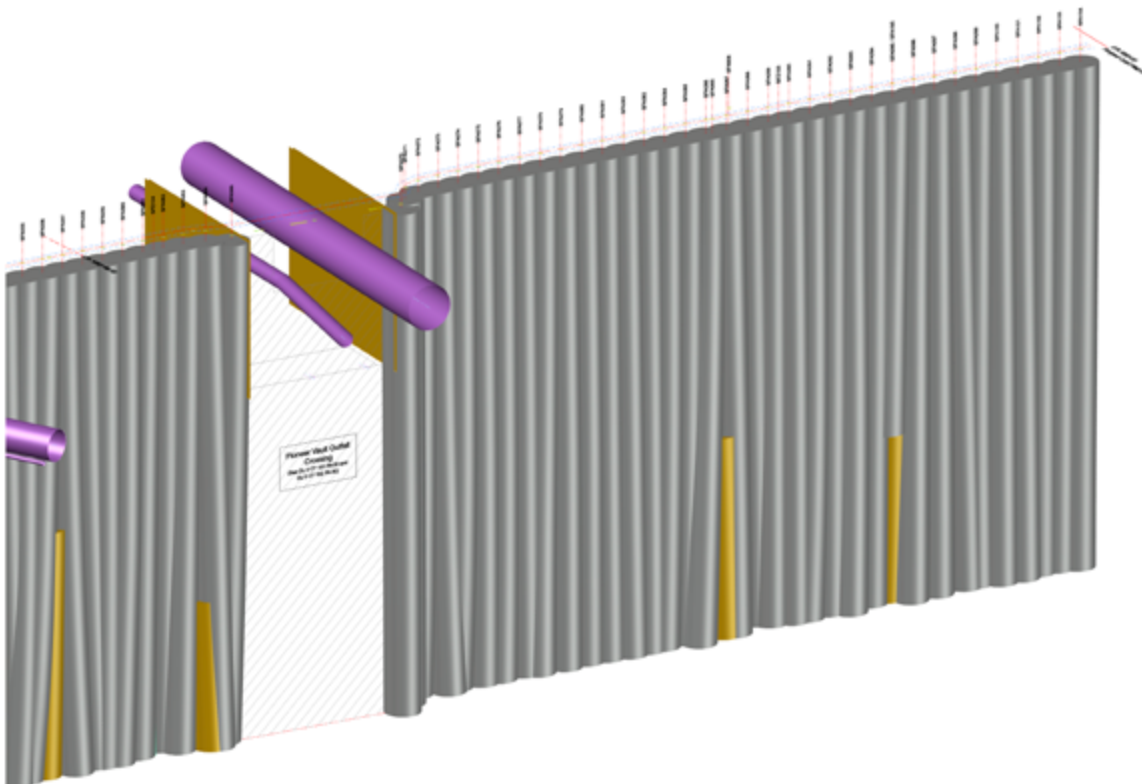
Section S1 | Pioneer Reservoir Outfall Crossing
